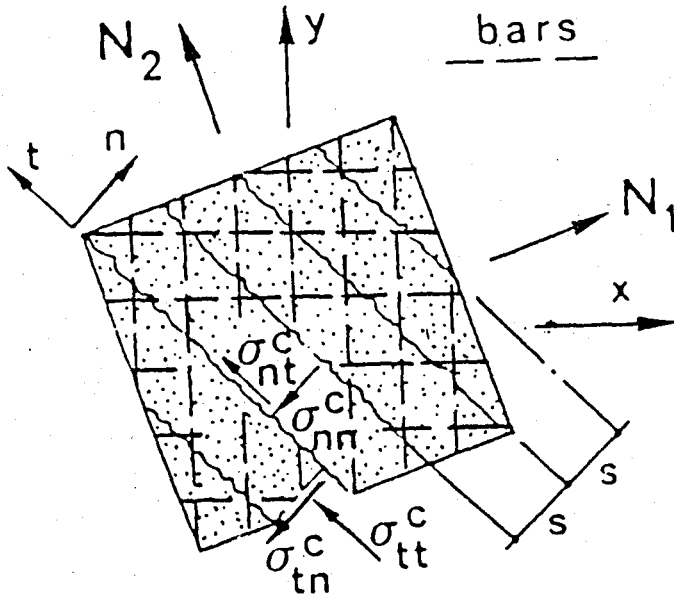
Cracked reinforced concrete (17)
